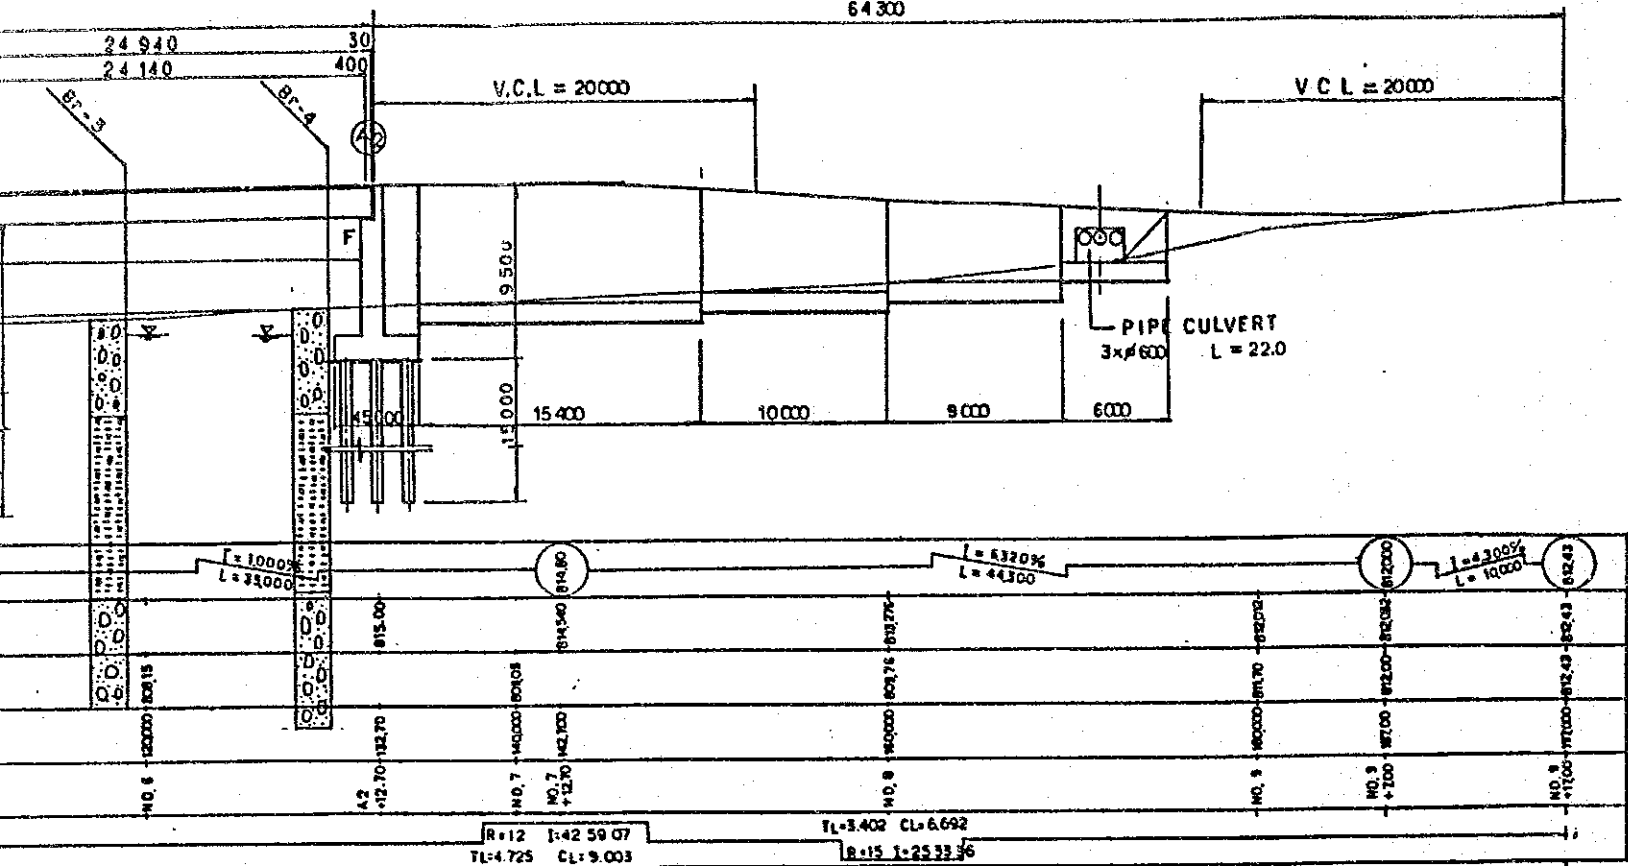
General Layout Plan of the No.16 Kaidon Bridge
